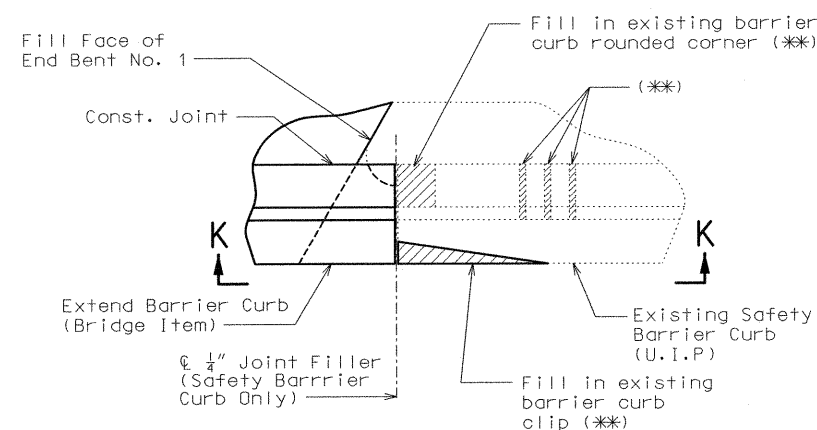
DETAIL SHOWING PARTIAL END POST REMOVAL AT LEFT PARAPET
